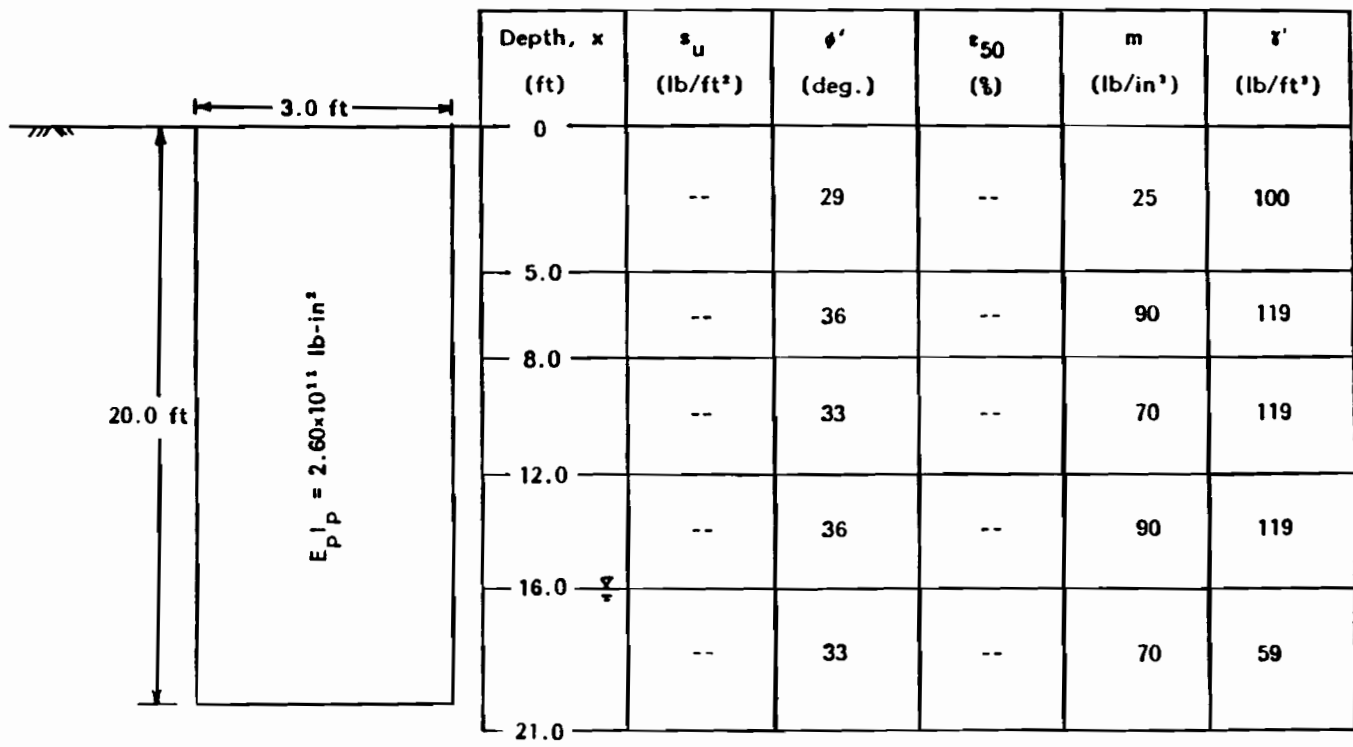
Soil and Drilled Shaft Data Used for COM624 Input, Shaft No. 19.
